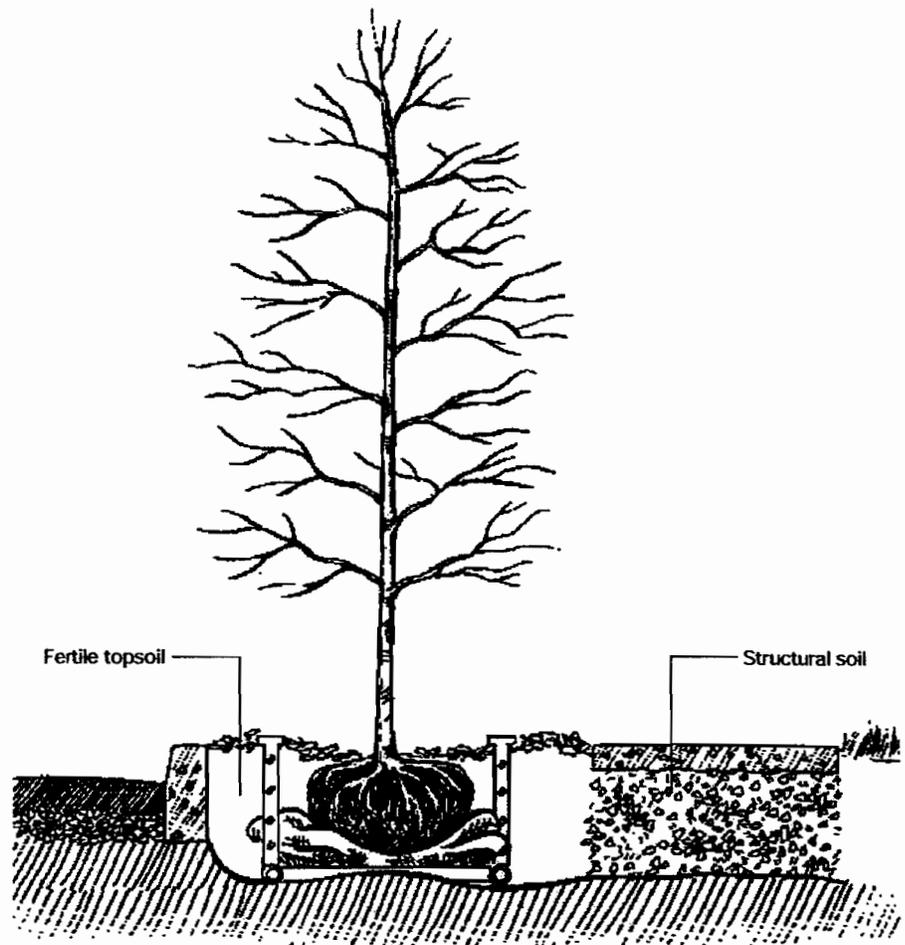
Root barriers used along with proper site preparation, species selection, planting, and watering can decrease damage to curbs and sidewalks.
